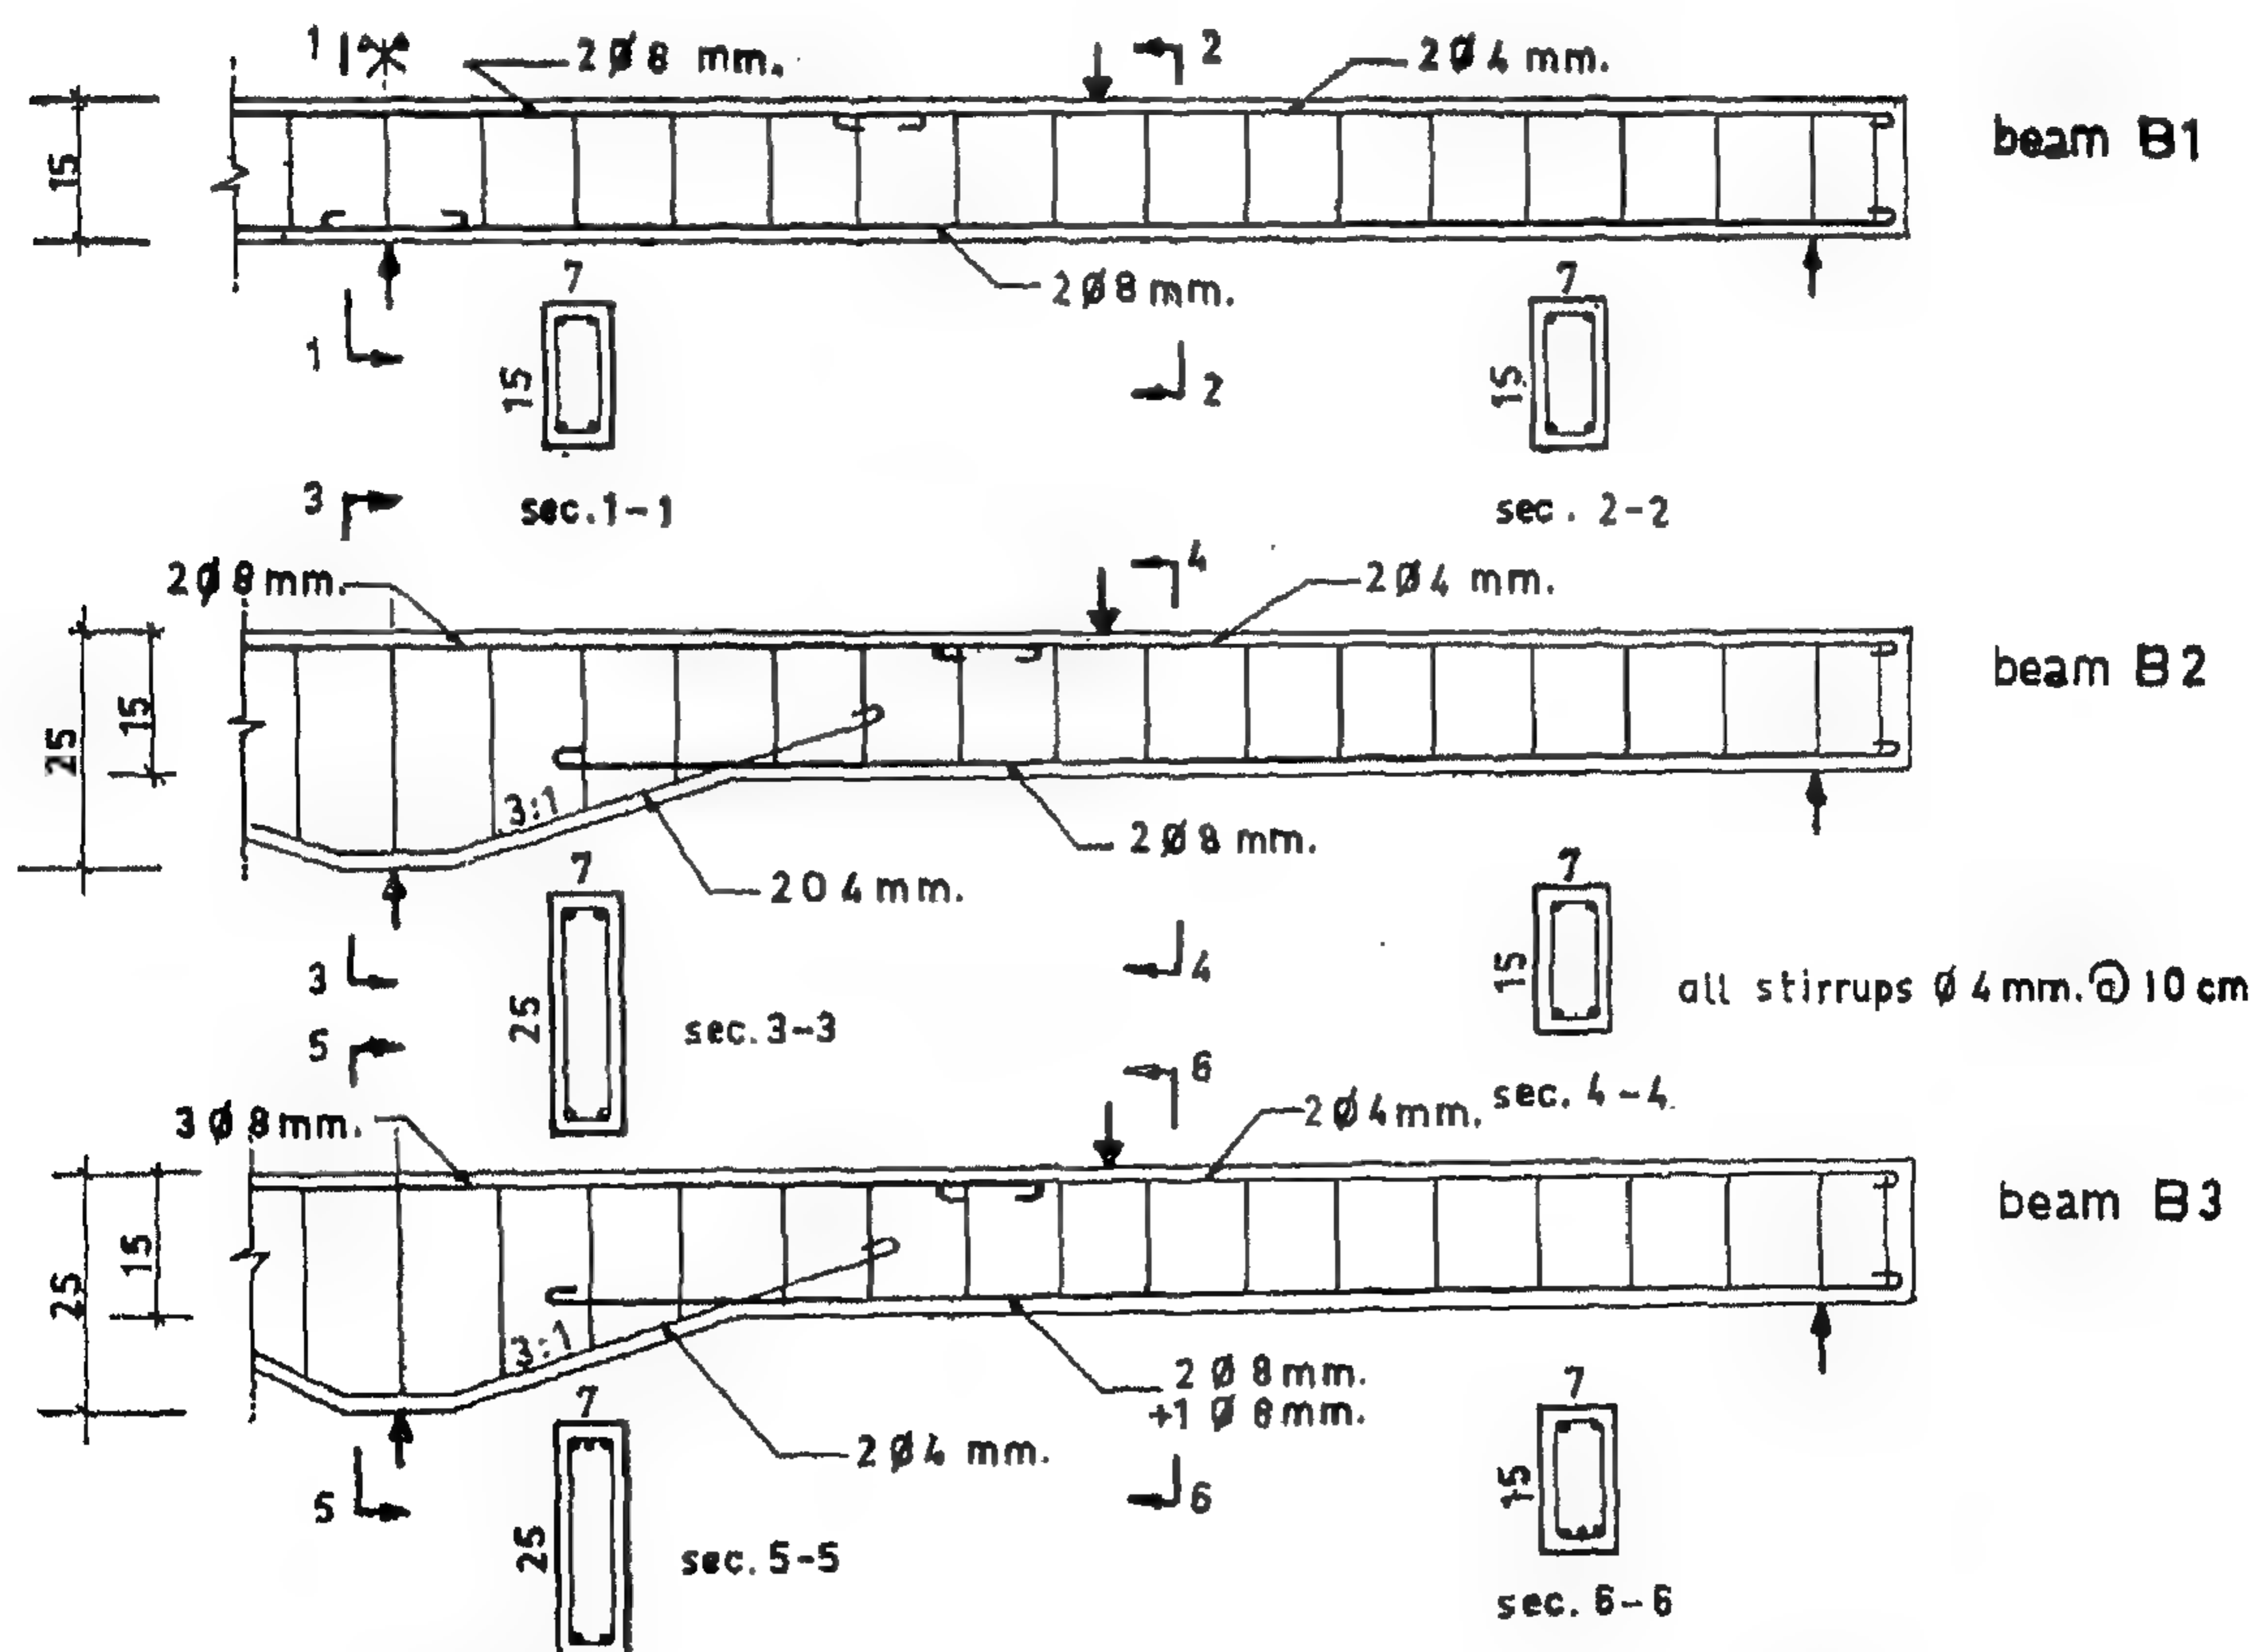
DIMENSIONS AND REINFORCEMENTS OF ANALYZED BEAMS.
